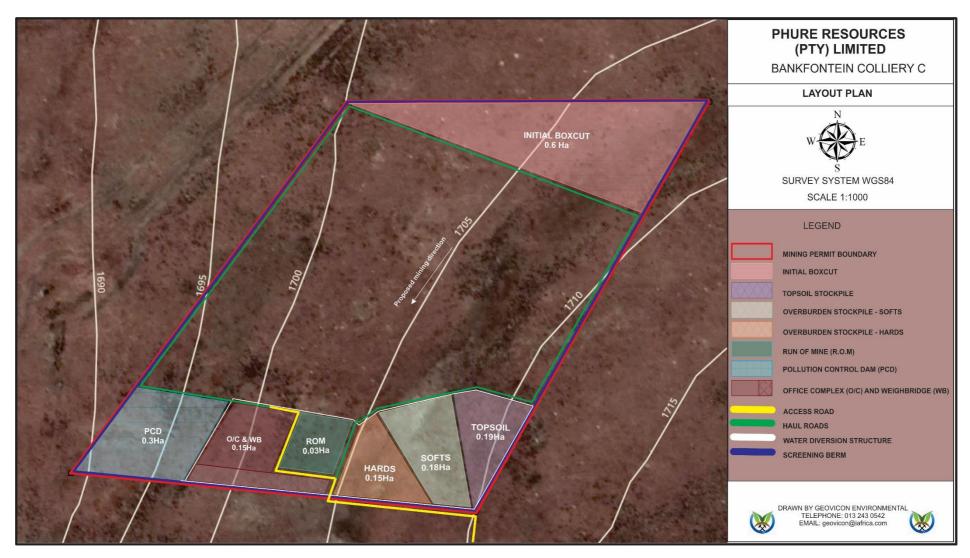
Surface layout plan, see attached Appendix C for an A3 format.
